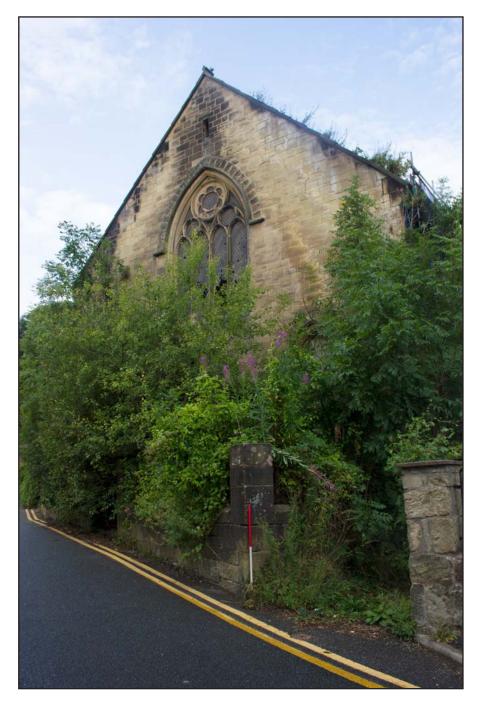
External east facing elevation, from the northeast. Scale 1.0m.
